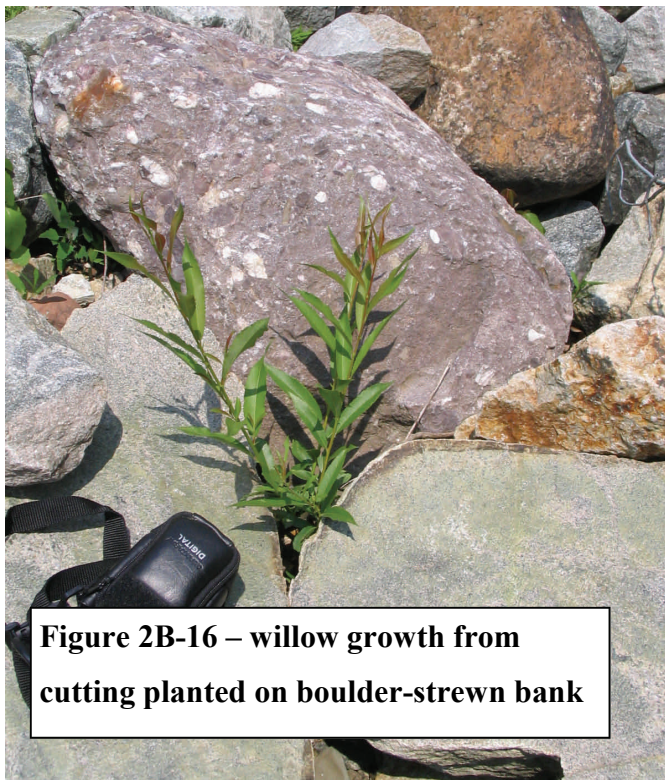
B-16 – willow growth from cutting planted on boulder-strewn bank
